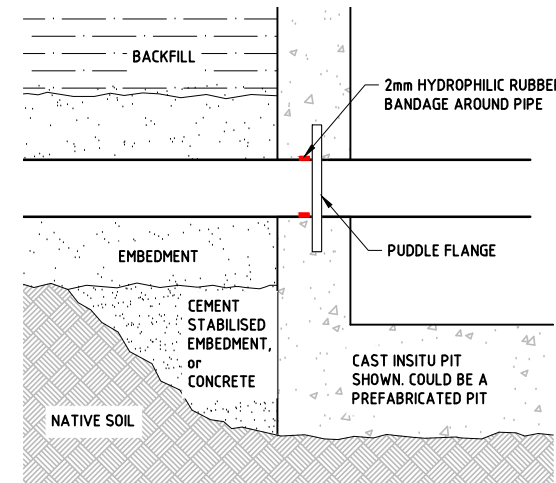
CAST IN SITU END WALL RESTRAINT (SECTION A)
